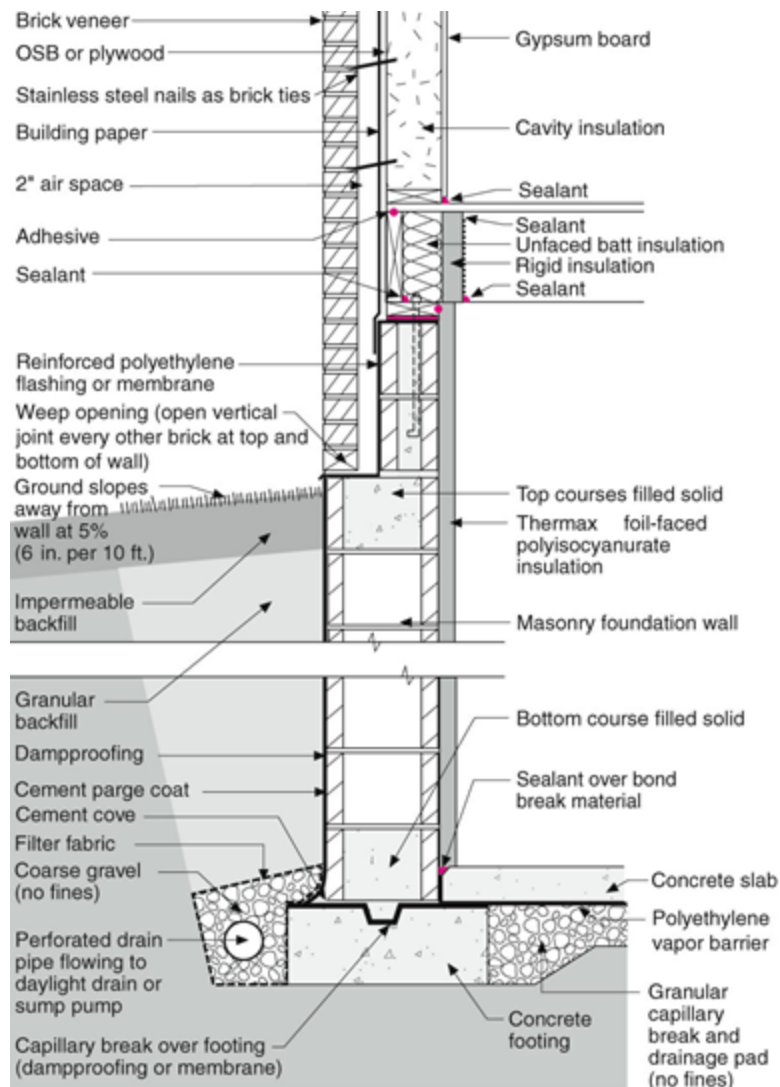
Section drawing of what would have been a recommended appropriate design from the beginning
